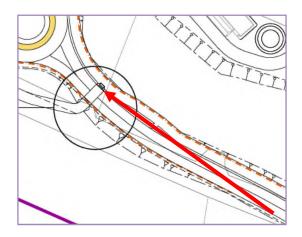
EW5604-00-029 Rev O, New Site Access Proposed Road Layout.
